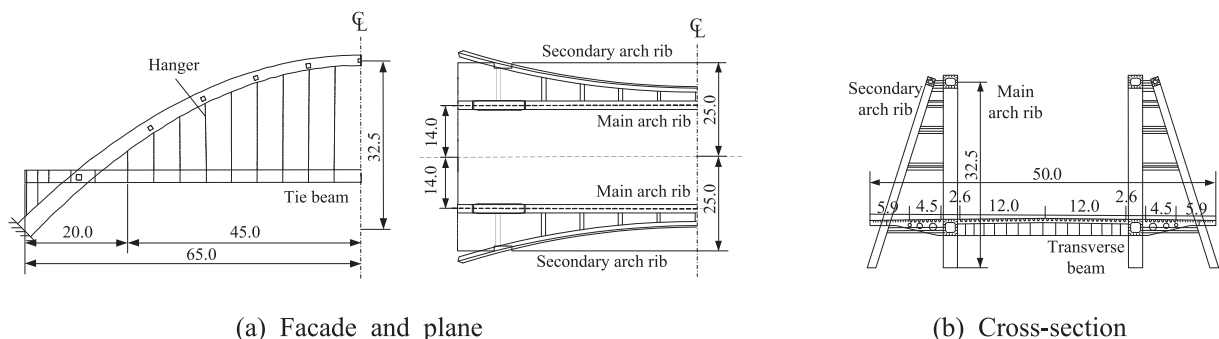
Overview of half-through steel arch bridge (unit: m). (a) Facade and plane, (b) Cross-section.
